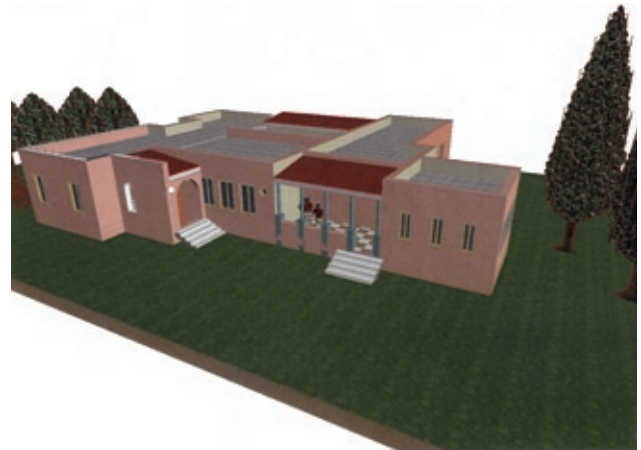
Small Adobe at Rancho Camulos seen from the northwest corner. The walls were retrofitted with center core rods throughout, because of the thinness of the walls and the large number of openings.
